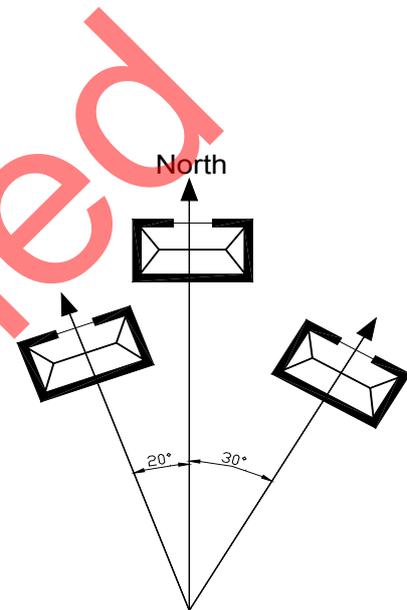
Desirable range of window orientation for north facing windows.
